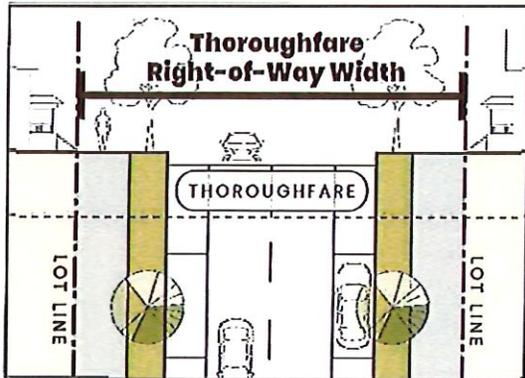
F: Thoroughfare Right-of-Way Width Measurement
